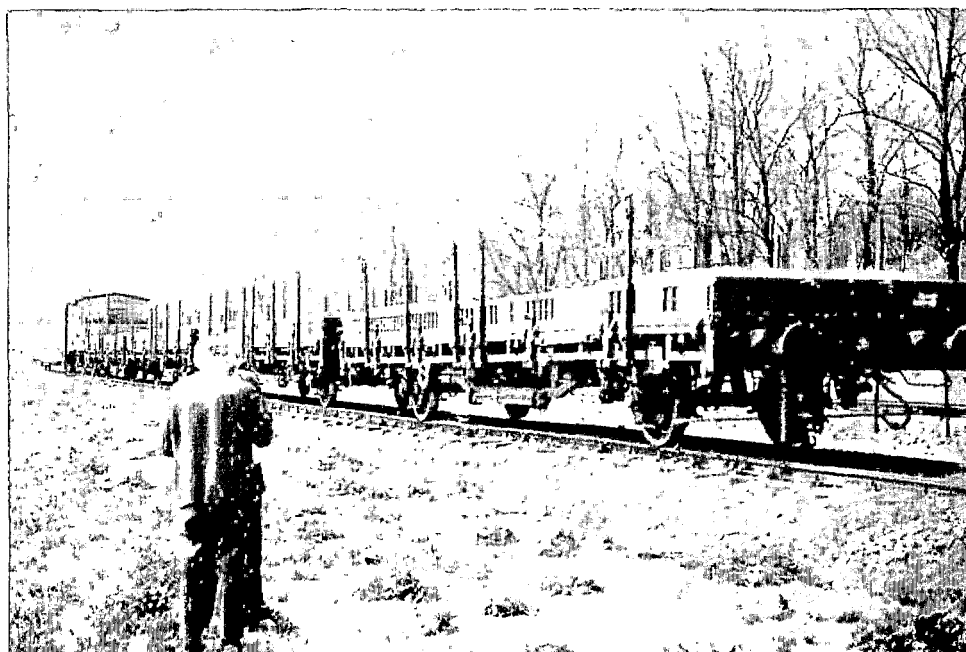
Hungarian Track Buckling Test Facility.
